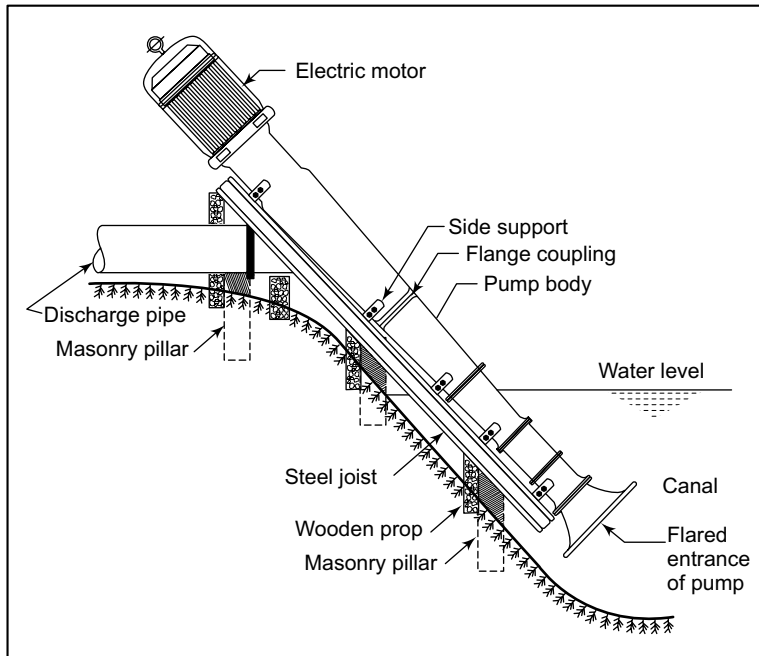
Angle-mount installation of a propeller pump to pump water from a canal
